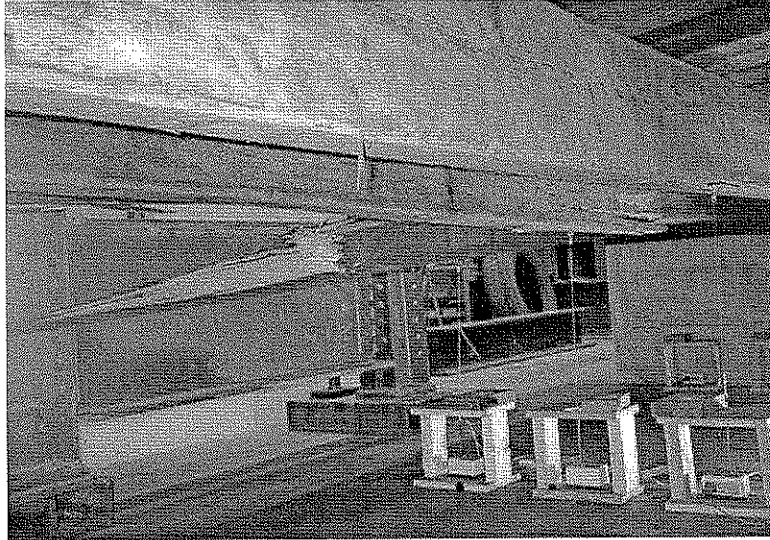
Stringers 1N, 2M and 3S (from right to left) after bridge failure - Bridge 3.
